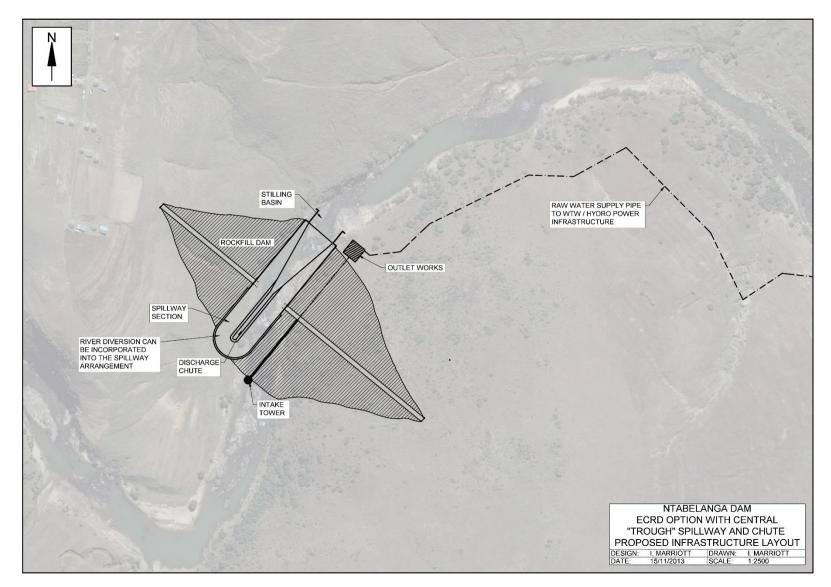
General Arrangement of a Composite Dam with Central (Trough) Spillway (CCS)
